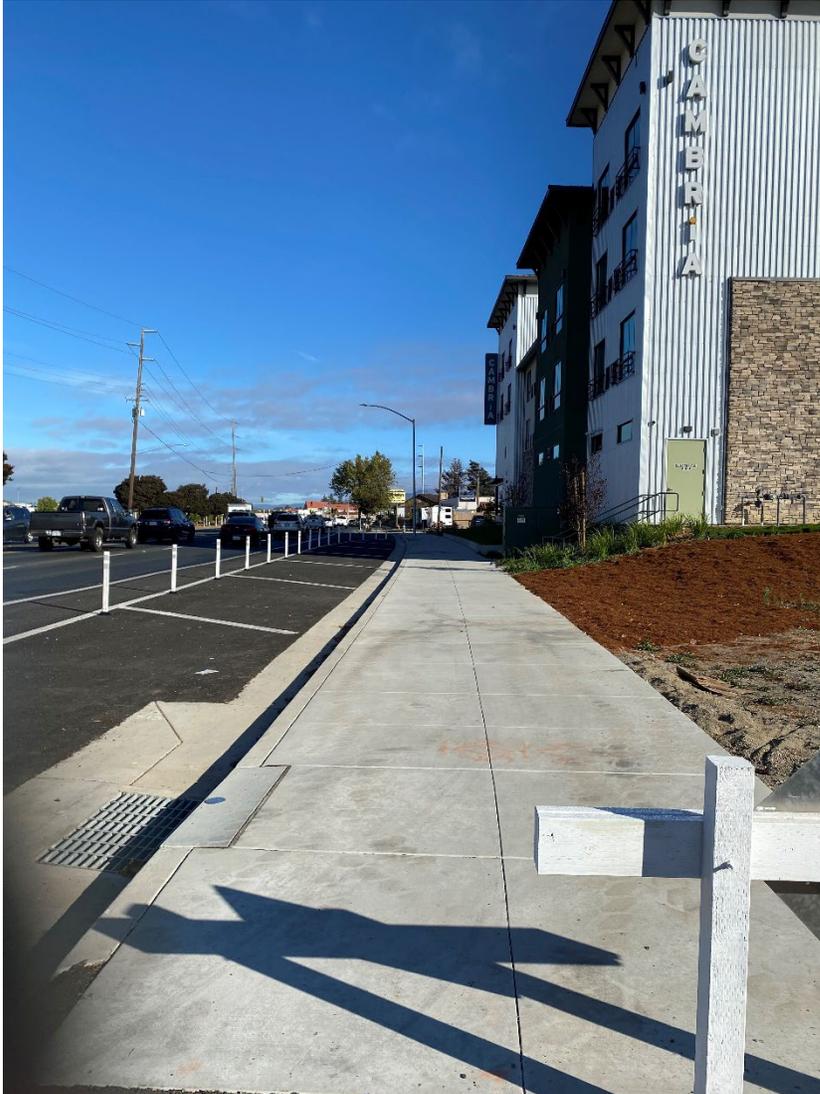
Taken from 320 Soscol Avenue from the sidewalk looking north, with the newly developed Cambria hotel on the right
